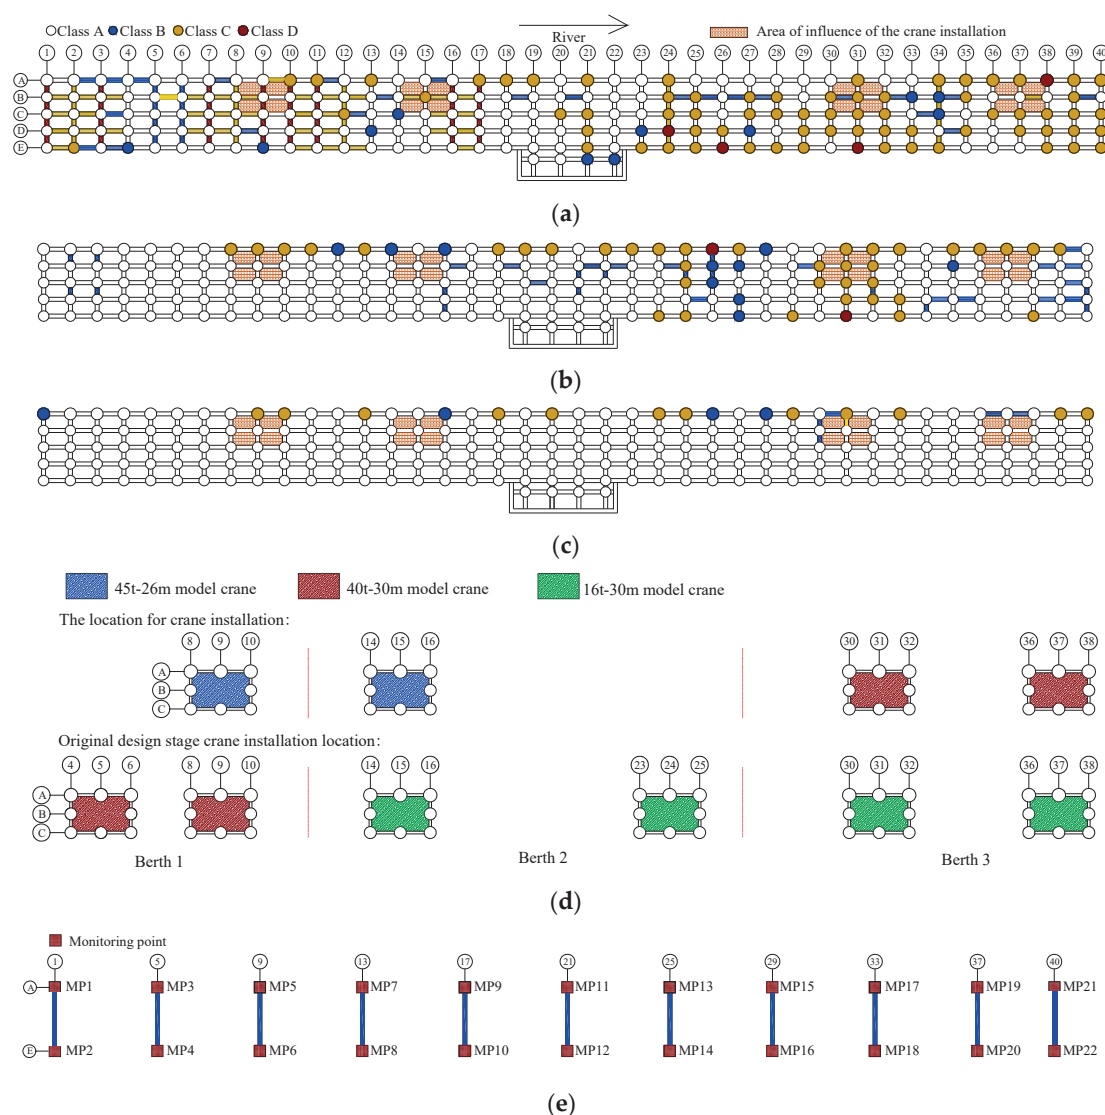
Distribution of cracks in the columns and tie beams and arrangement of the crane: (a) first layer; (b) second layer; (c) third layer; (d) surface; (e) arrangement of the displacement monitoring project.
